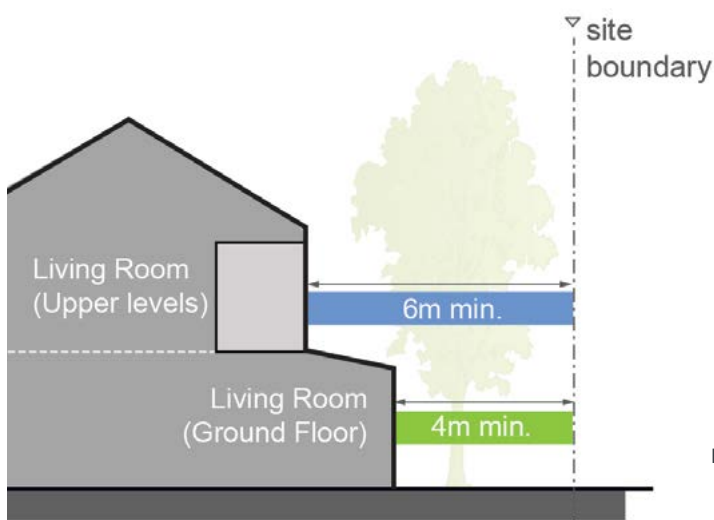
Ground level and upper level living rooms should have greater setbacks to neighbours to improve privacy
